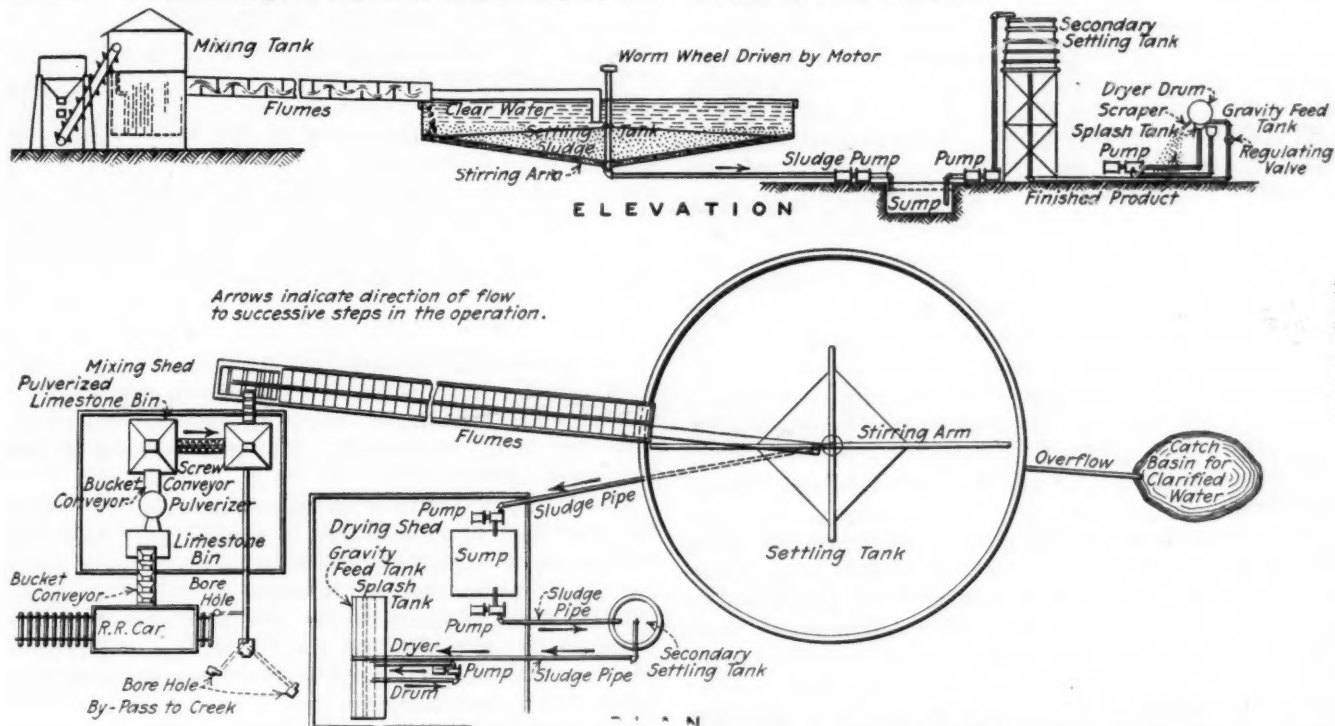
PLAN AND DIAGRAMMATIC ELEVATION OF THE WATER-NEUTRALIZATION PLANT
